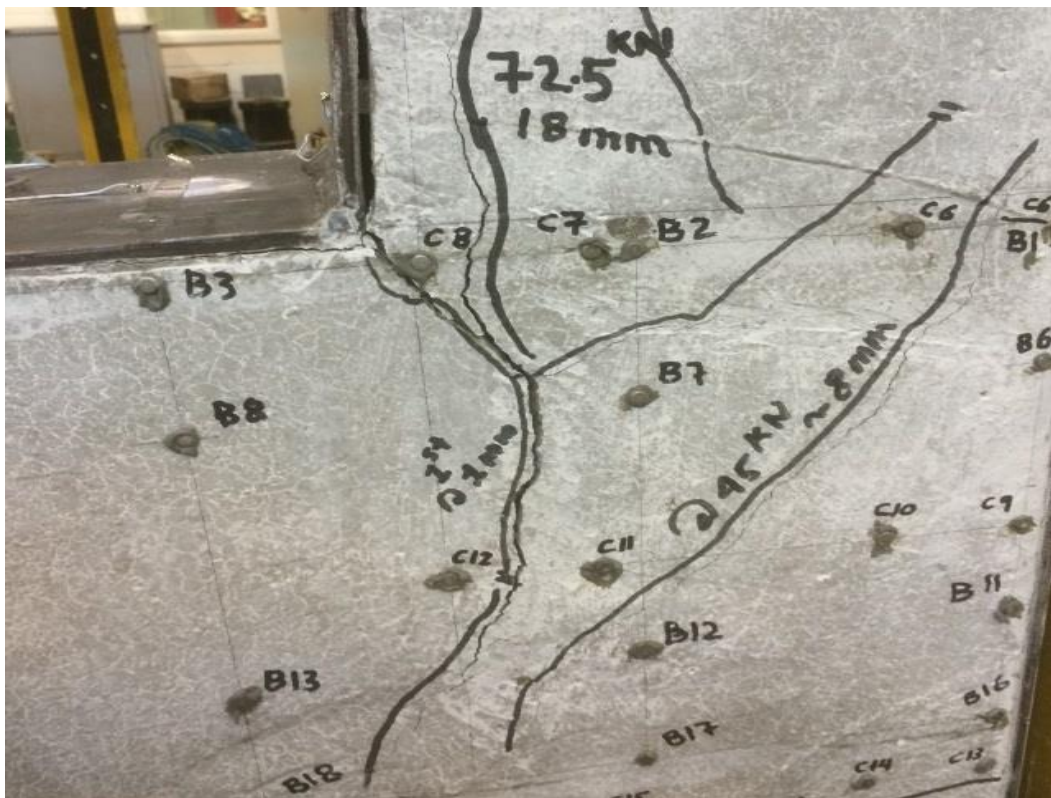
Second SCS joint with welded bars before stud failure
